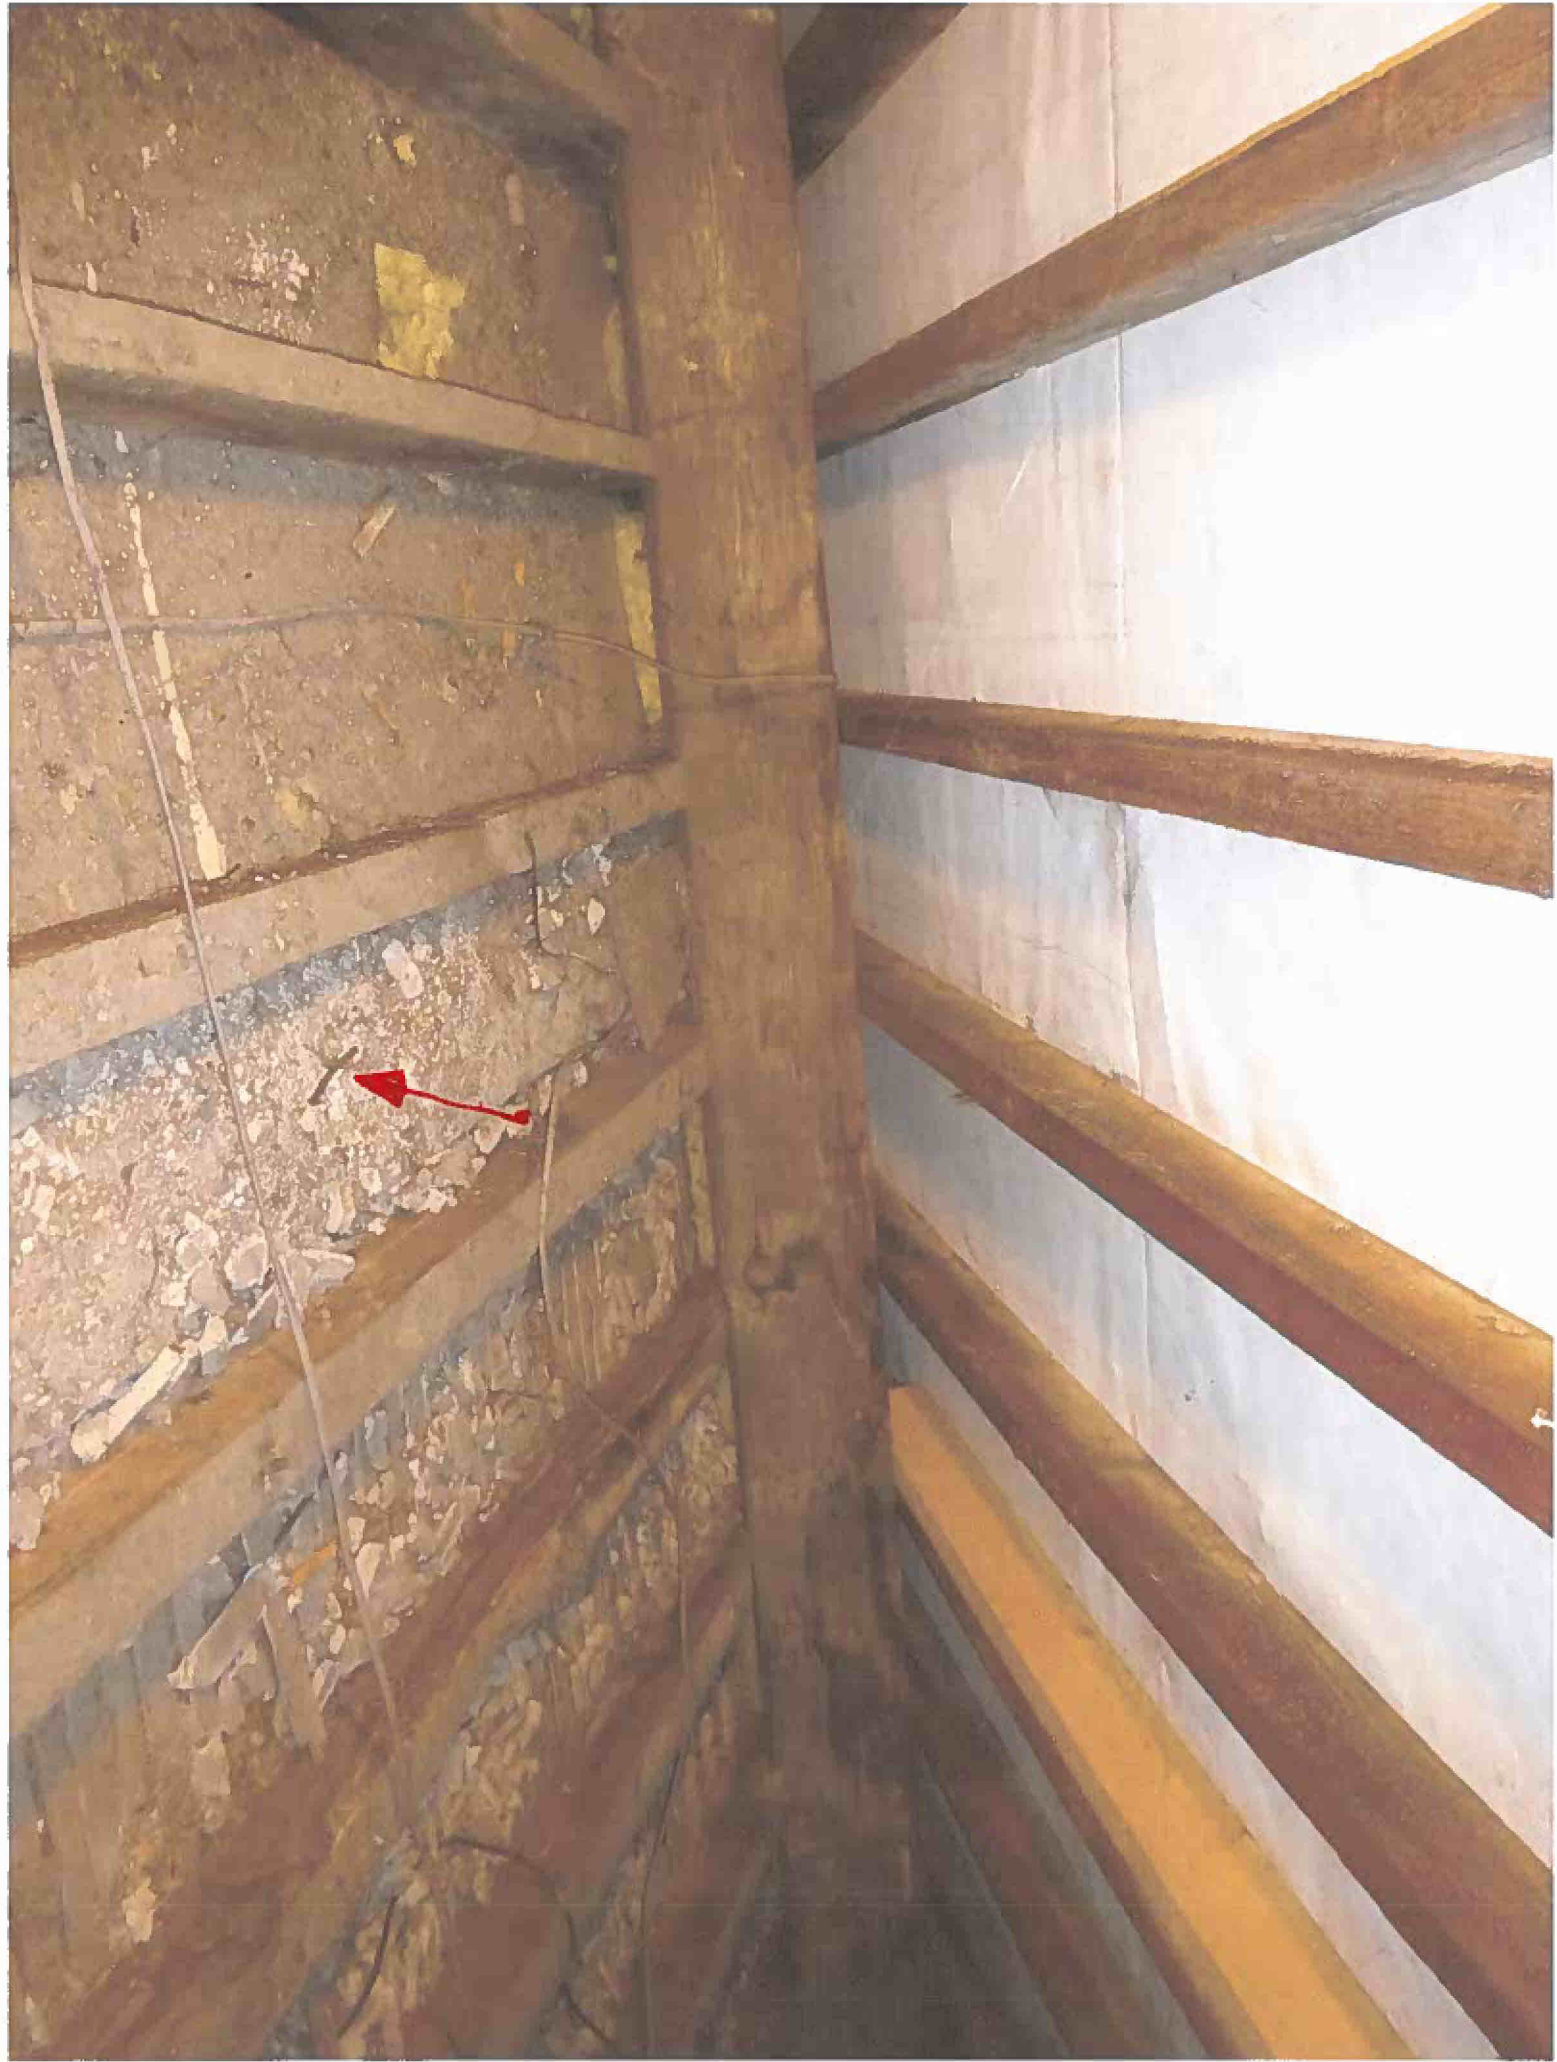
LOCATION OF WALL TO BE REMOVED, NEW ROOF FELT
